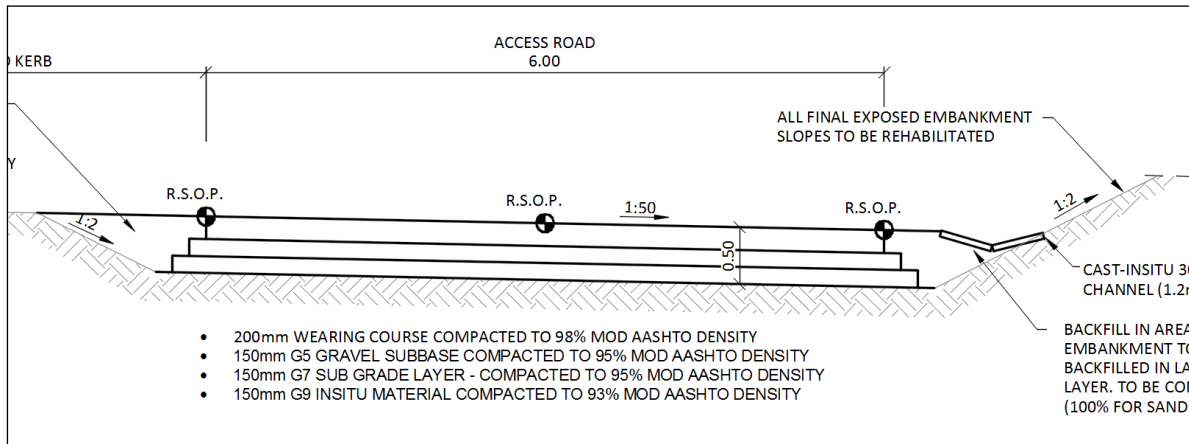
Typical Cross-section Details of Access Roads 1 & 2
